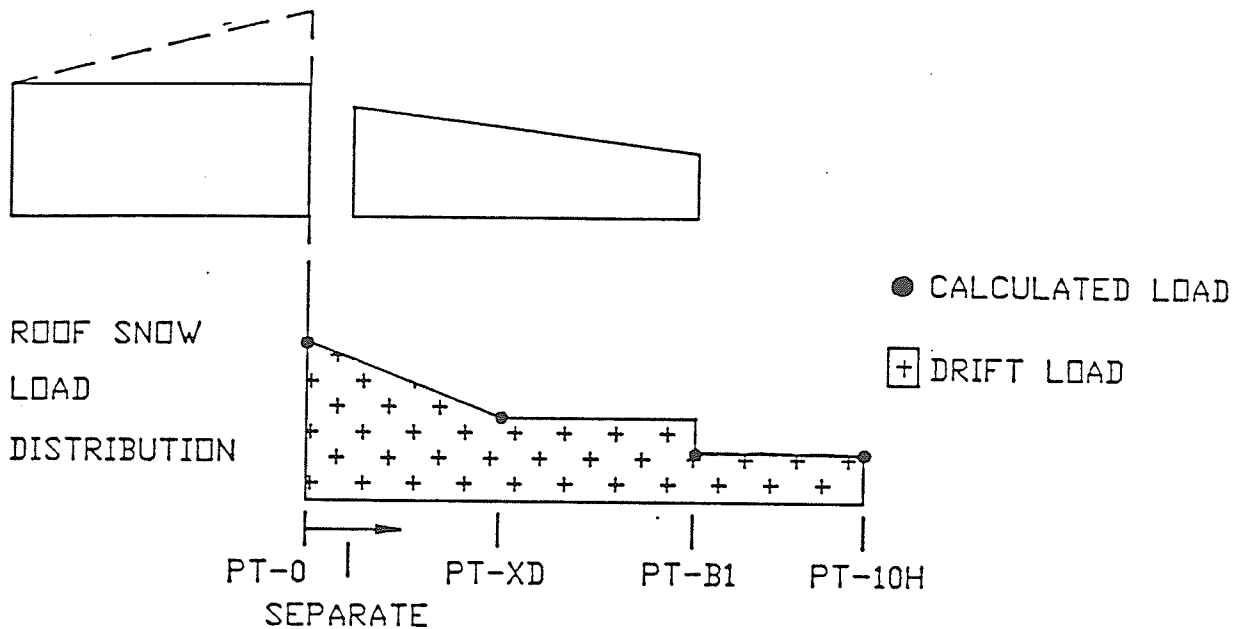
(3) : SNOW LOAD DISTRIBUTION ON MULTI-LEVEL ROOF
